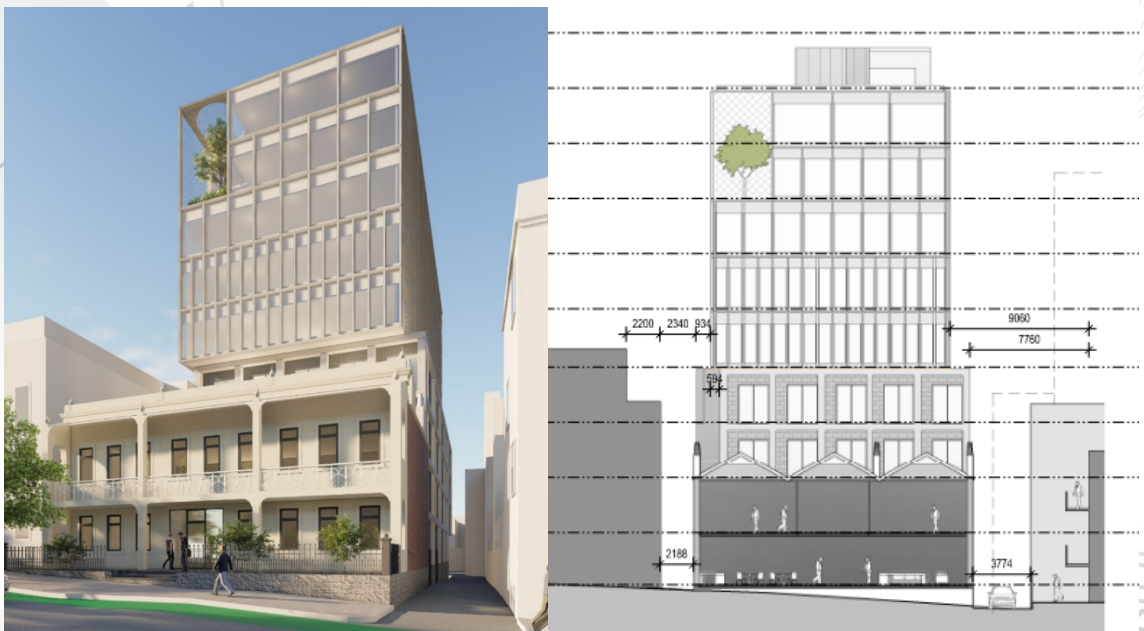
An architectural render of the proposed building and a cross section through the front section of retained building, both extracted from the amended VCAT plans.
